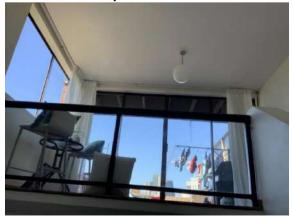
(left): View to the south from First Floor, Unit 3 rear balcony Figure 14 (right): View from Unit 3 stairs to Unit 3 Mezzanine
